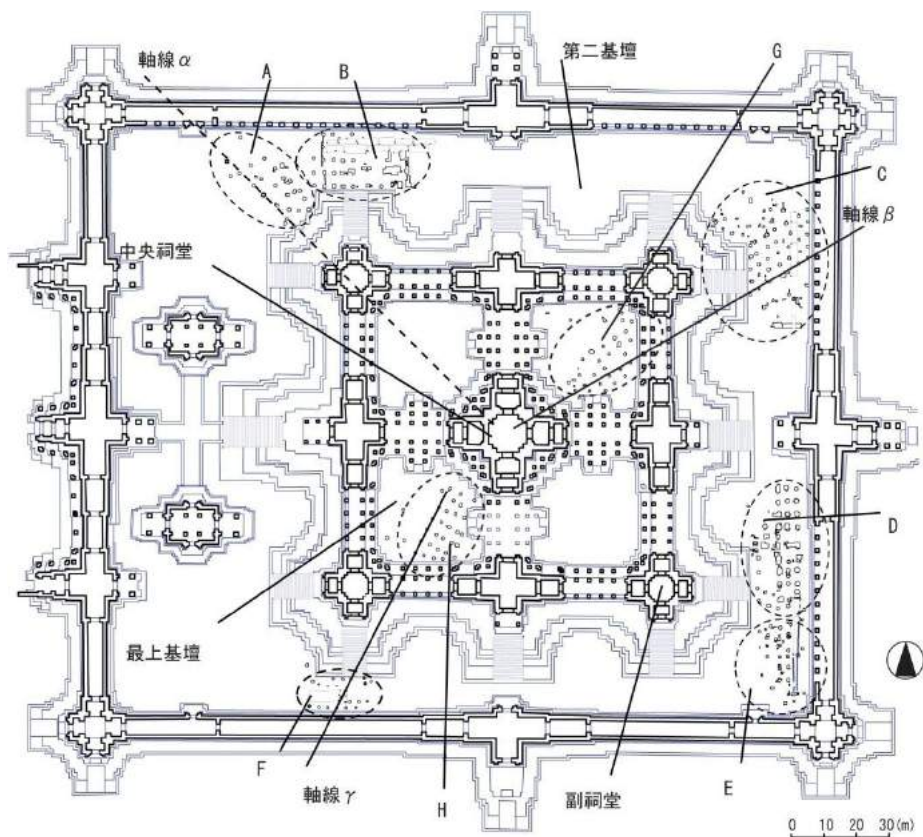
Plan of the first and second enclosures showing the locations of the large postholes in the floor (Sawada 2008).
